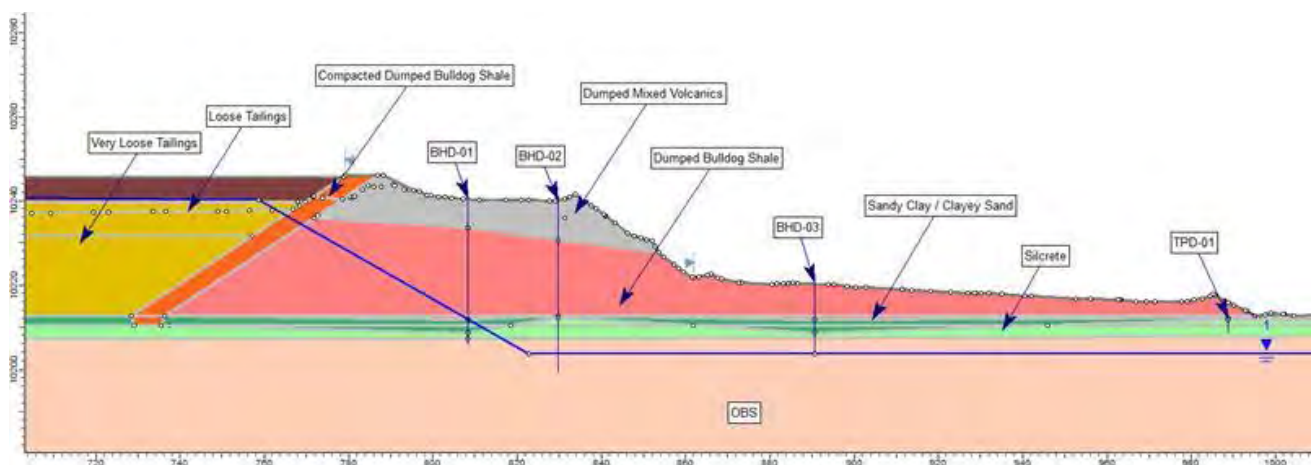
Stage 6 TSF layout at Section D (processing plant alignment)
